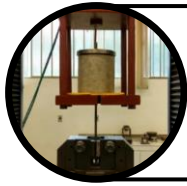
Pull-out test setup and the molded specimen (10d bond length case)
